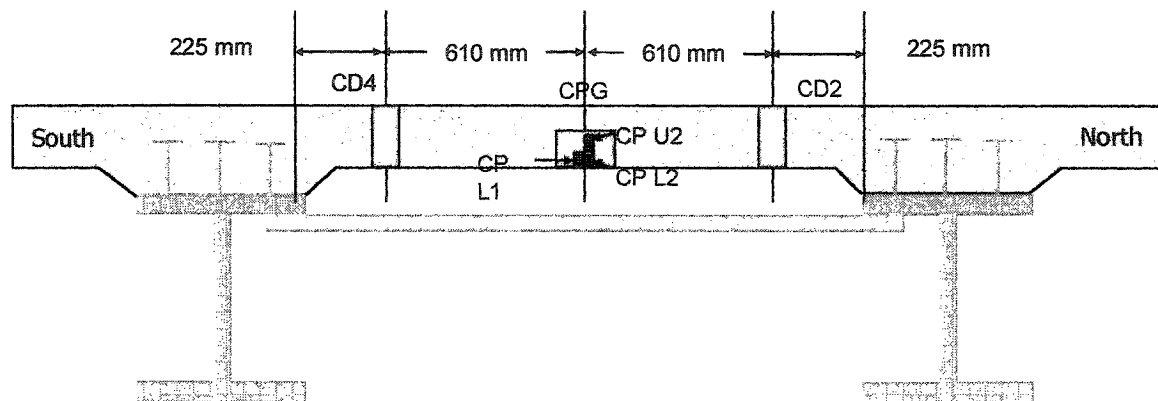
Cross-Section of Panel-A at Centre Showing Positions of Crack Detection and Crack Propagation Gauges
